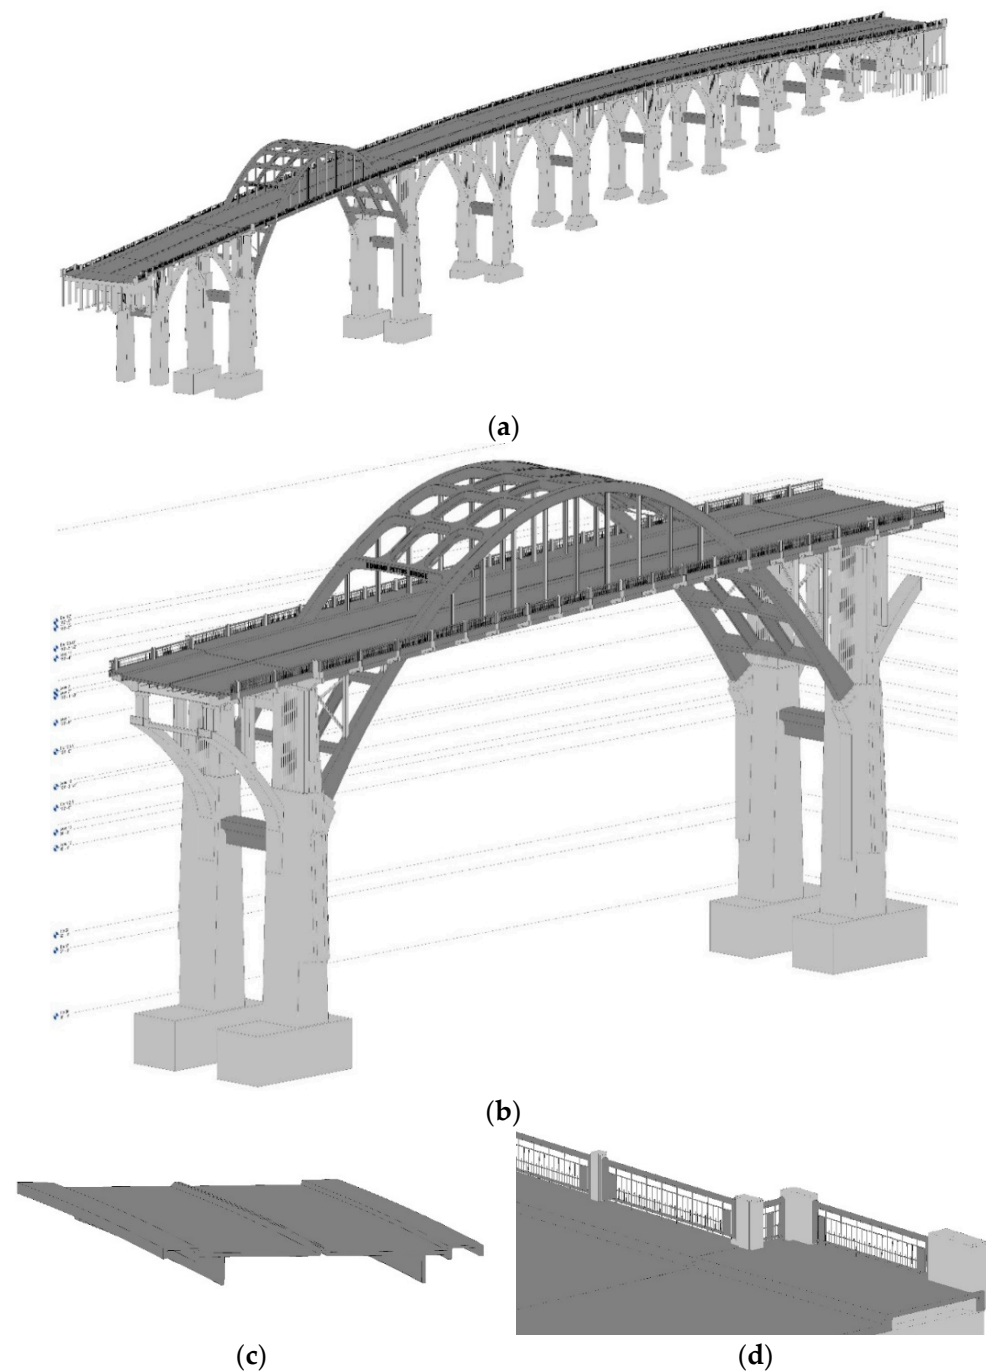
Complete BIM model of Edmund Pettus Bridge. (a) The complete BIM model of the bridge. (b) The main arch of Span-2 with Pier-1 and Pier-2. (c) A typical decking platform. (d) North approach railing.
